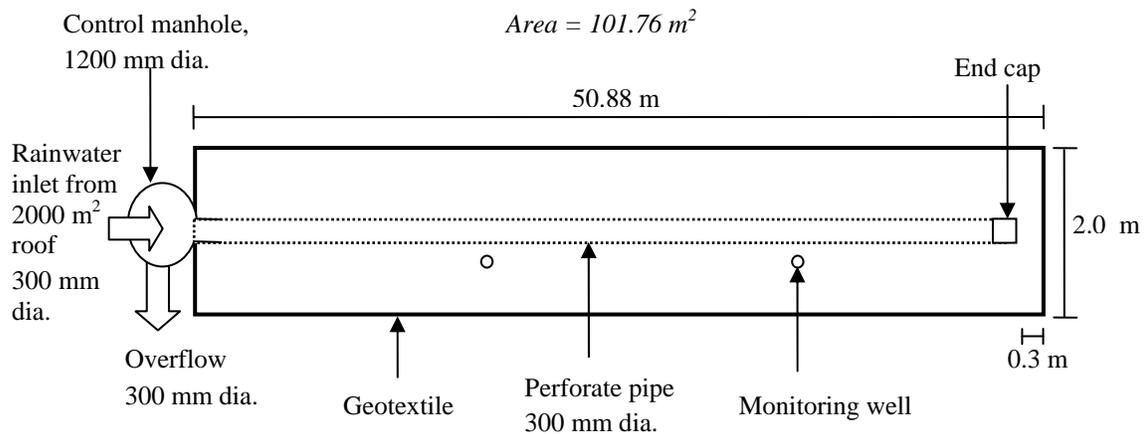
Plan view of the infiltration trench receiving roof runoff only
